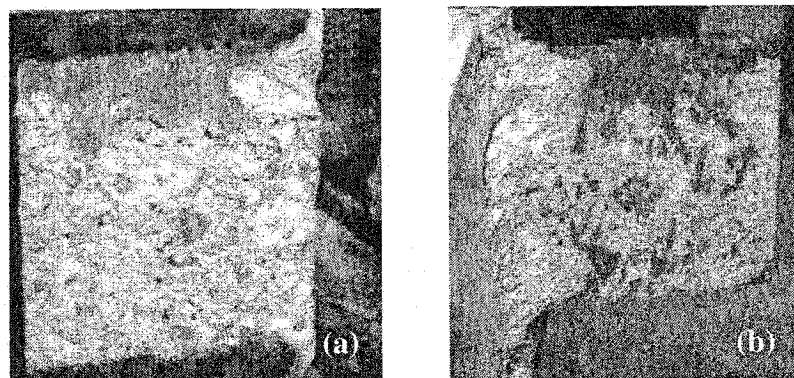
Push-apart failure surface (a) concrete (b) CFRP sheet
